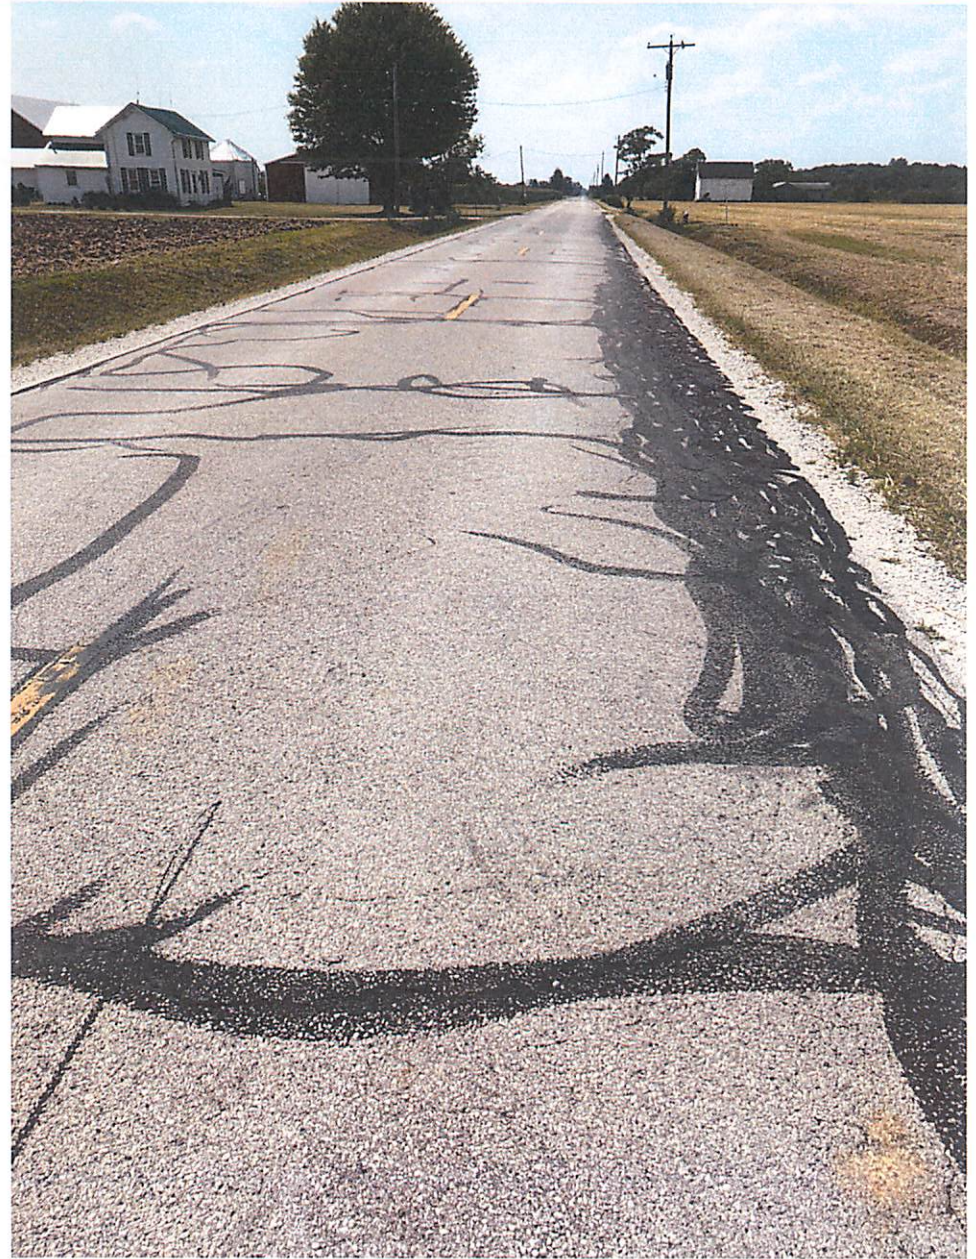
& 4 – Pavement Failures, Raveling & Block Cracking
